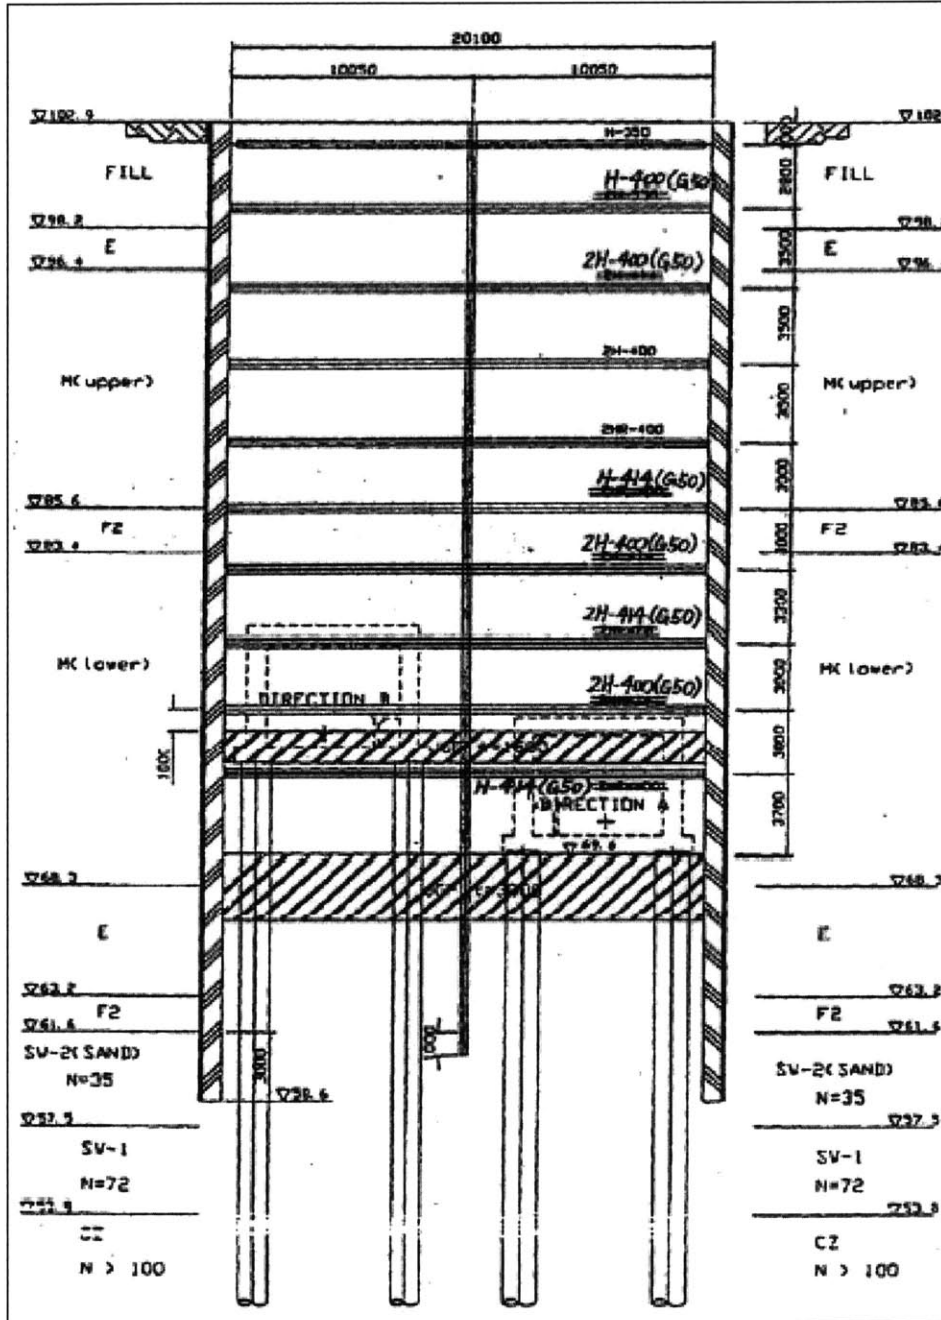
Cross-section for wall Type M3 (MOM, 2005)
